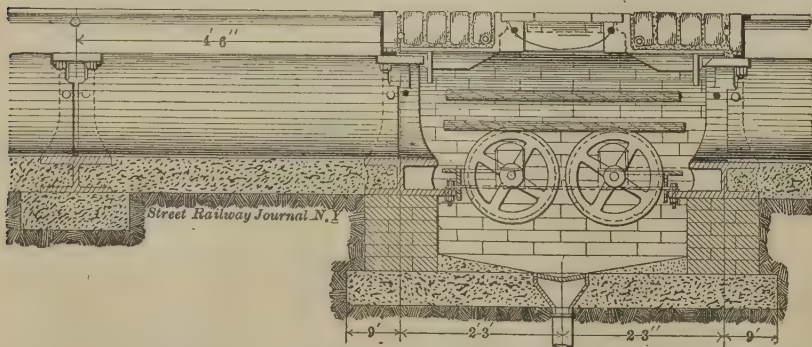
A.—CONDUIT, SHEAVE PIT AND GRIP HATCH—BROADWAY, NEW YORK, CABLE LINE.
